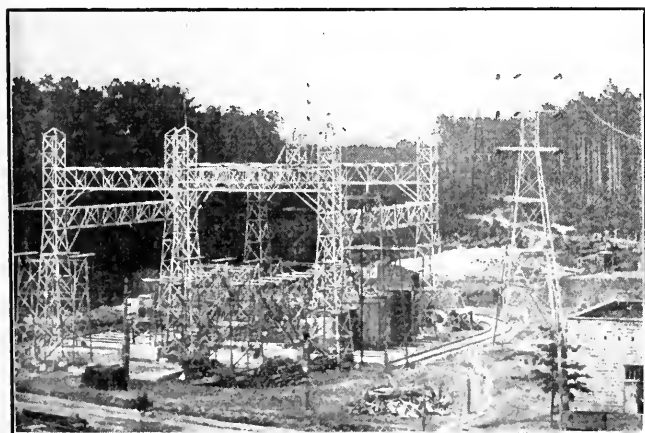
OUTDOOR SUBSTATION UNDER CONSTRUCTION
